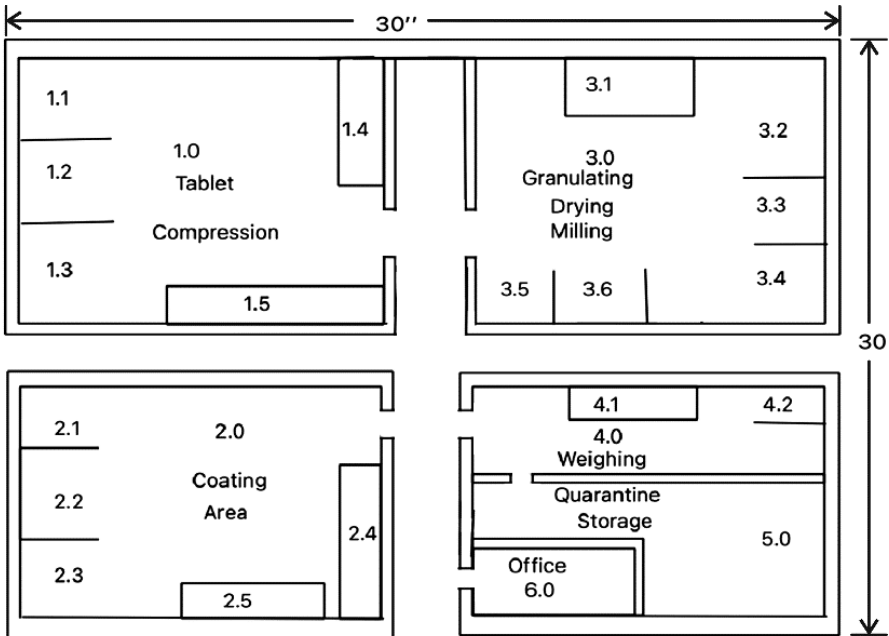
Floor plan for a small pilot plant for tablet development.
